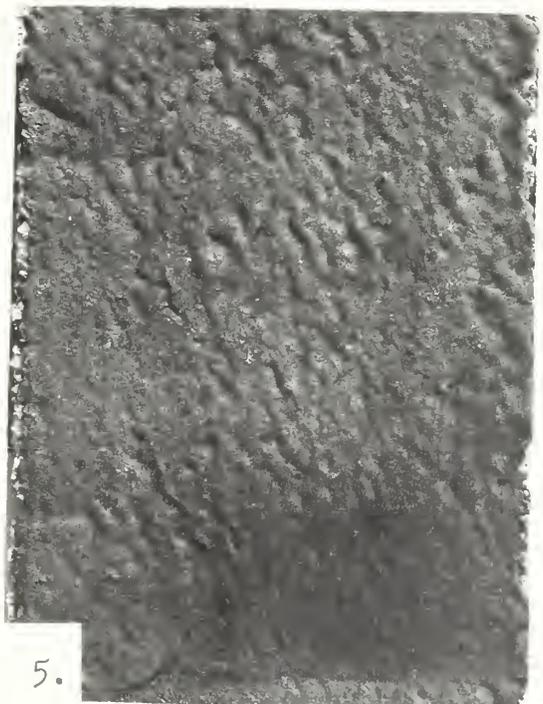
Coatings on cinder block - 2 years outdoor exposure.
